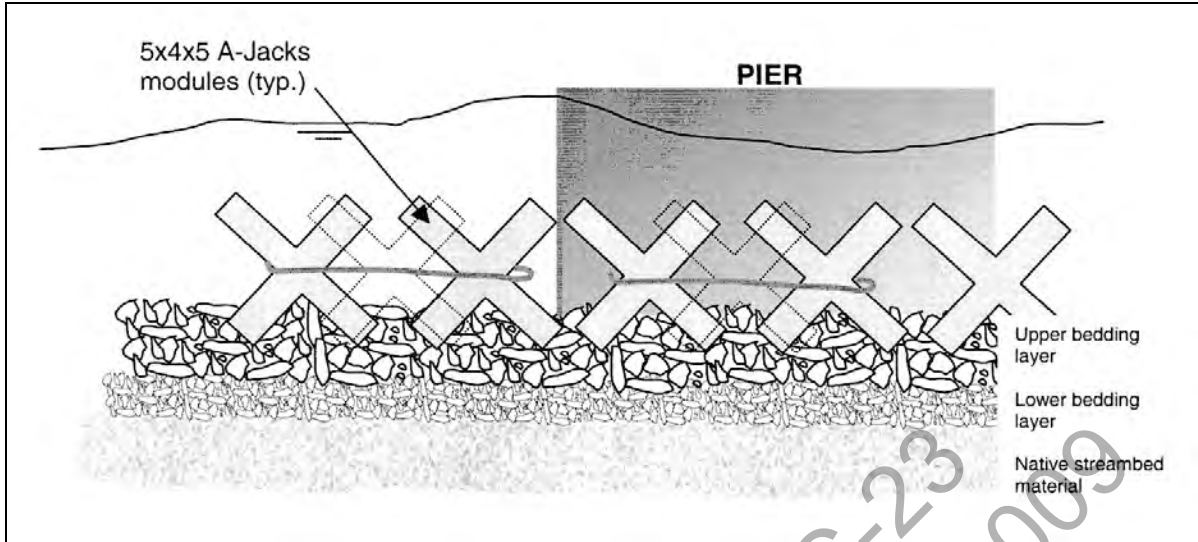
Bedding detail showing two layers of granular bedding stone above native streambed material.⁽¹²⁾
